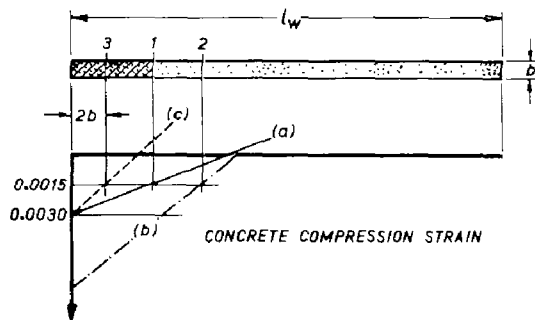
Strain profiles affecting the lateral stability of thin wall sections.
